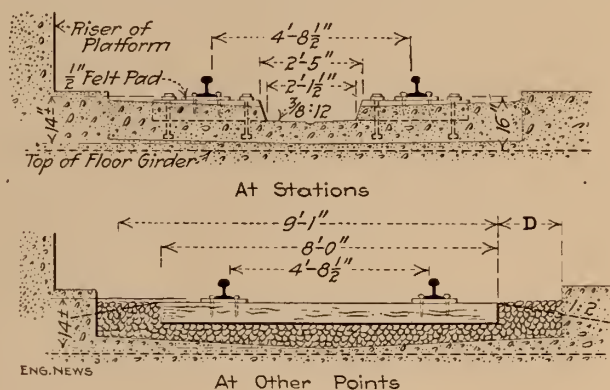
TYPICAL CROSS-SECTIONS OF TRACK
